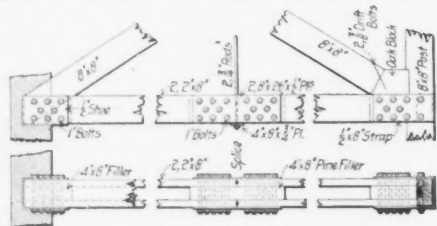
Design of Timber Roof Truss, by W. W. Brush.
